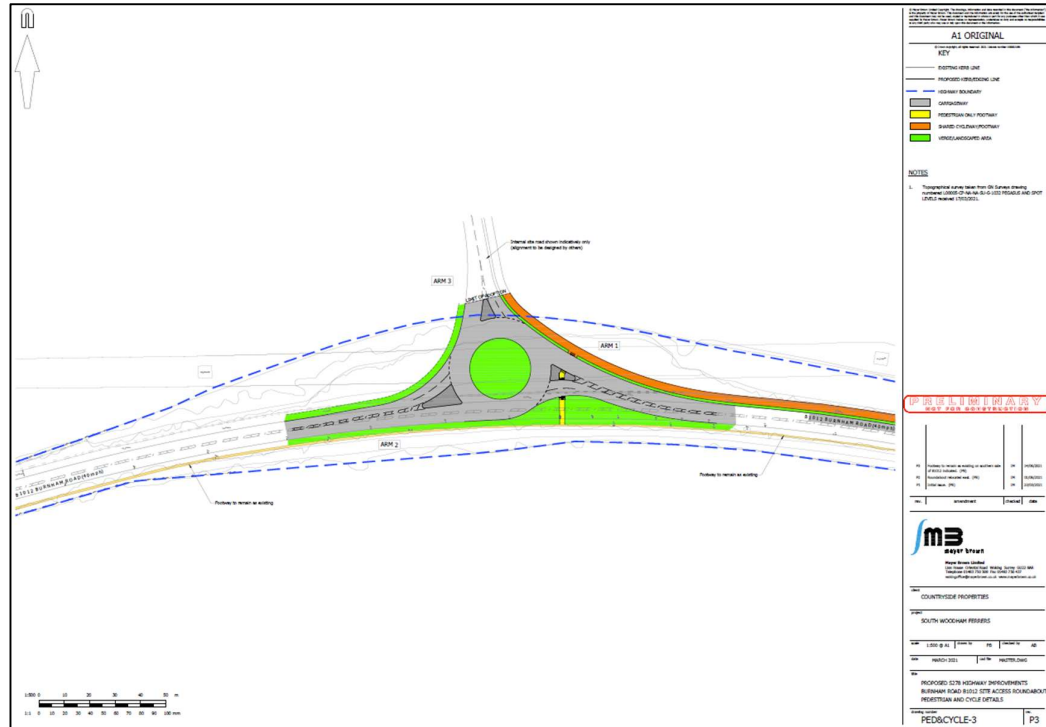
Proposed B1012 Burnham Road/Site Access Roundabout Layout
